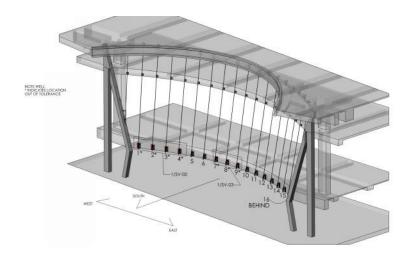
The kinked columns on this conoid wall are cast-in-place reinforced concrete. The cross section was extremely close to the design dimensions.
